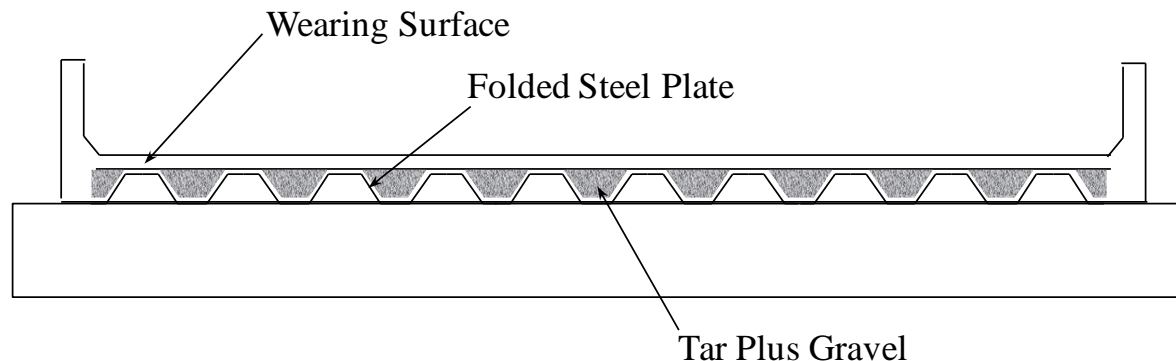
An Orthotropic Deck with Steel Folded Plate.
